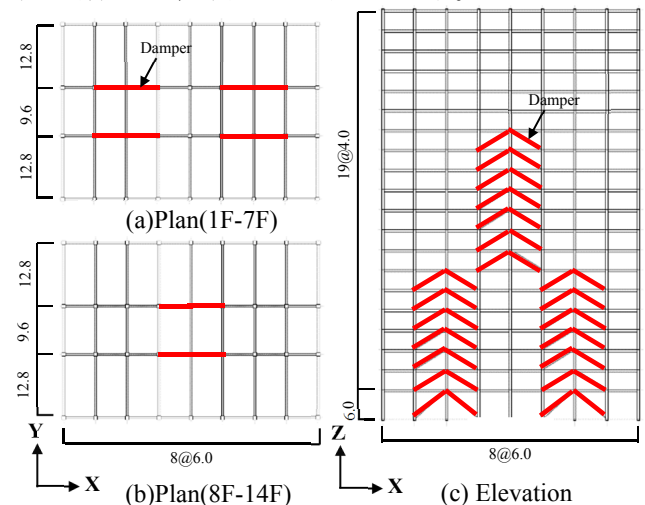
Plan and elevation with dampers in X-direction (unit: m)
